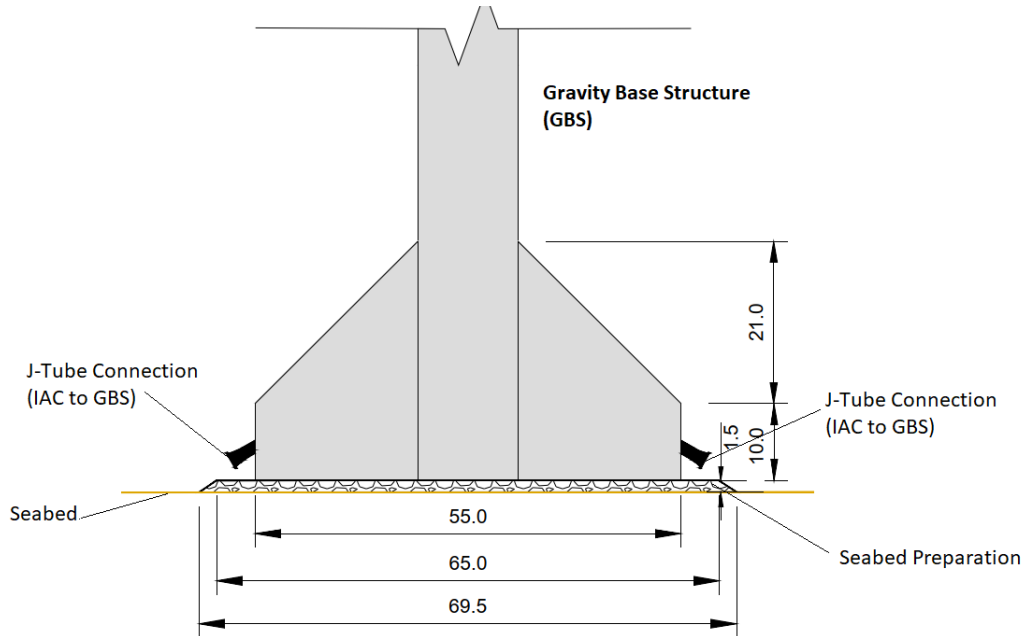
Cross section of the 'ELI' GBS foundation to be used for the Project
